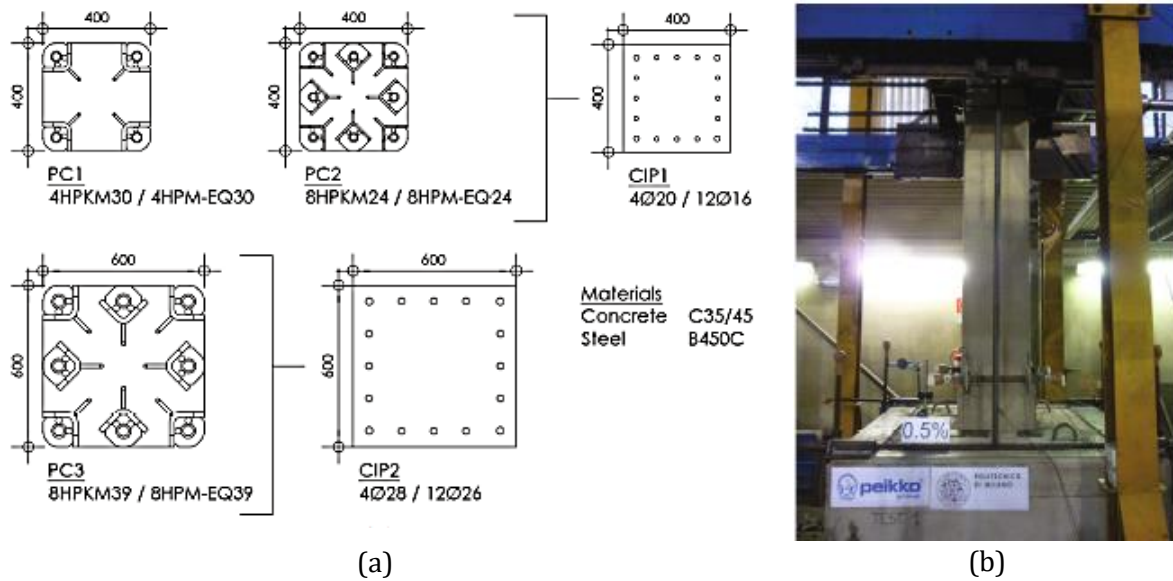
(a) Column cross-sections and material details of the specimens; (b) general view of the test setup
